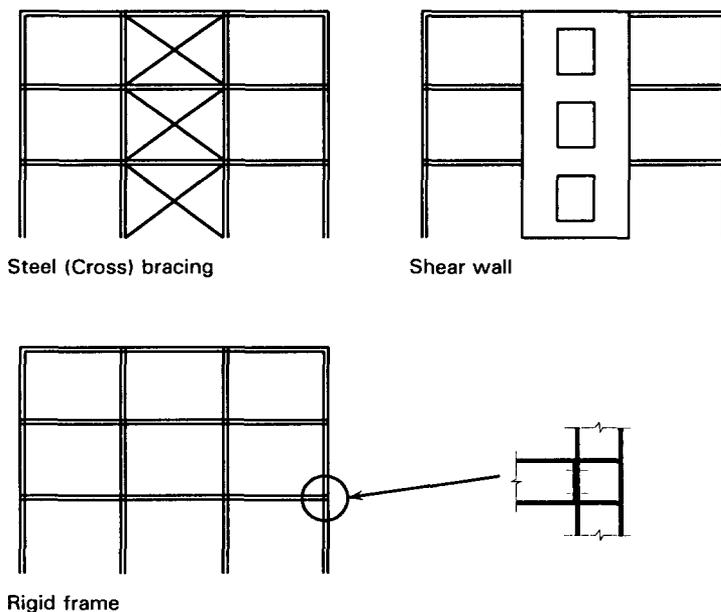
Ways of providing stability and resisting horizontal loads; braced frames (with steel bracing or a shear wall), unbraced frame (relying on member and connection rigidity)
